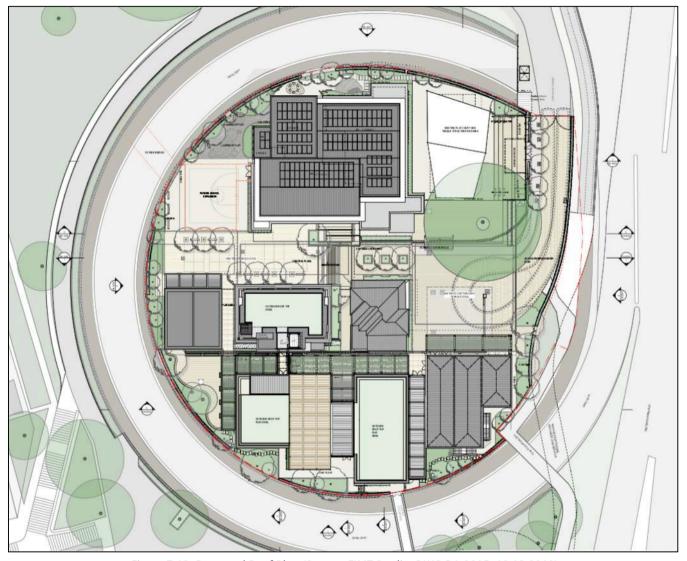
Proposed Roof Plan (Source: FJMT Studio, DWG DA-2005, 18.12.2019)
